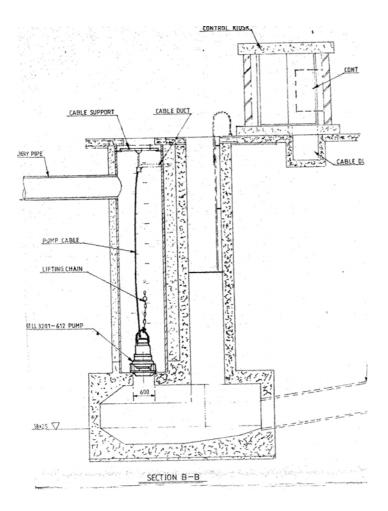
Layout of the pumps and pipework detail at Highbridge pumping station
